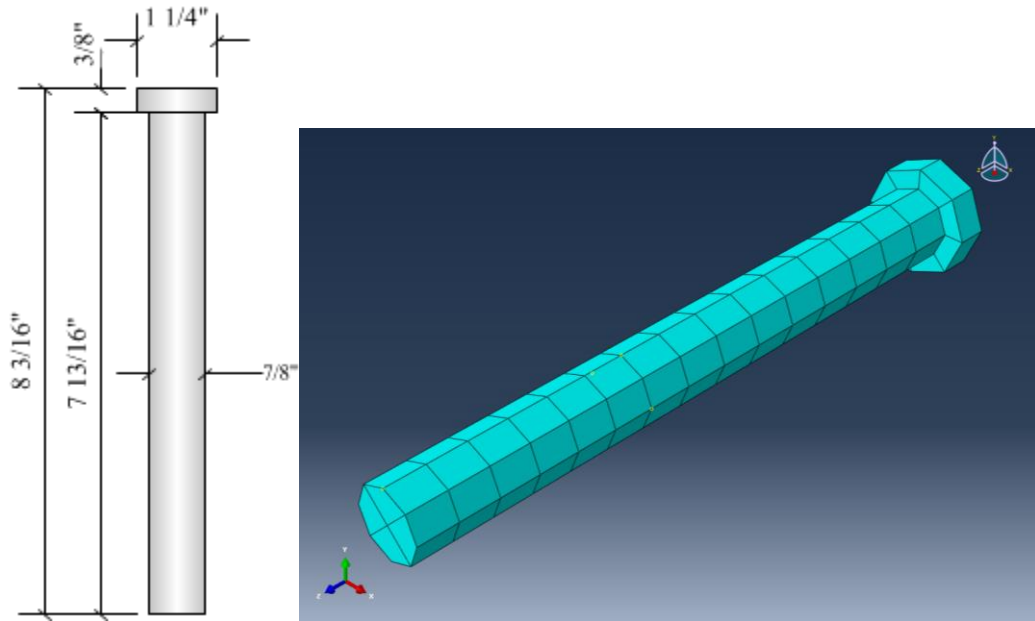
Shear Stud Connector Dimensions and as Modeled (brick elements)
